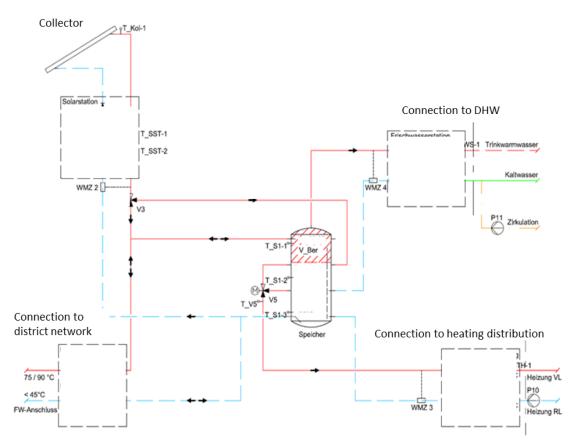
Layout of the hydraulic system in the buildings (Source: badenovaWÄRMEPLUS GmbH & Co. KG)
